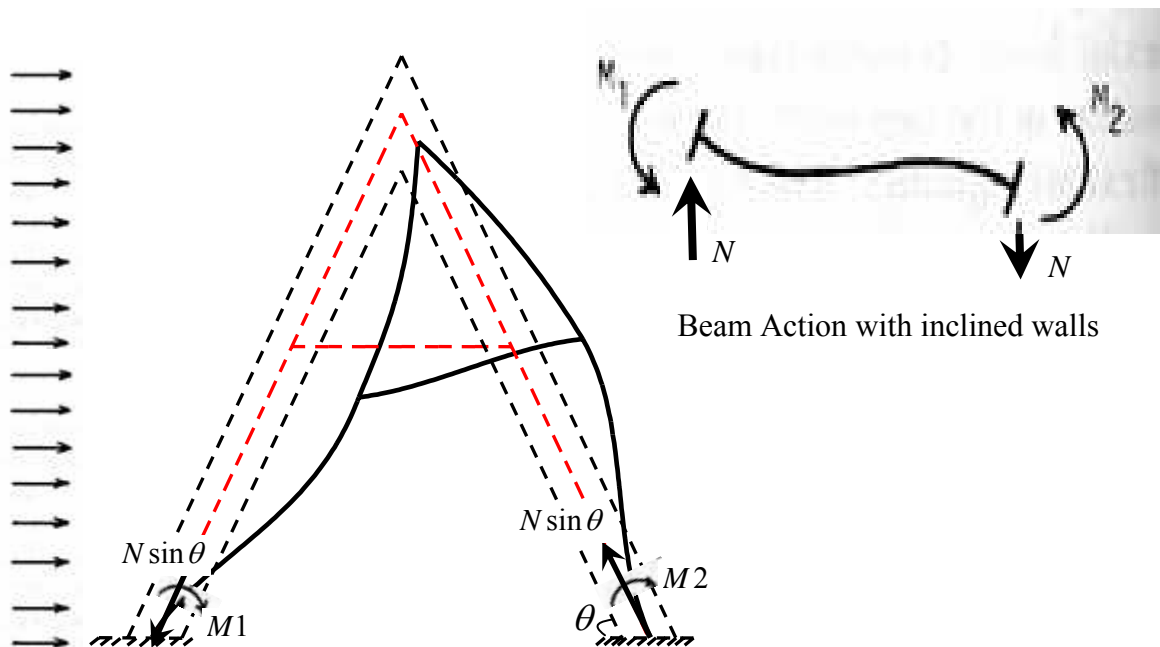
Behaviors of Inclined Coupled Structural Walls under Lateral Wind Loads
